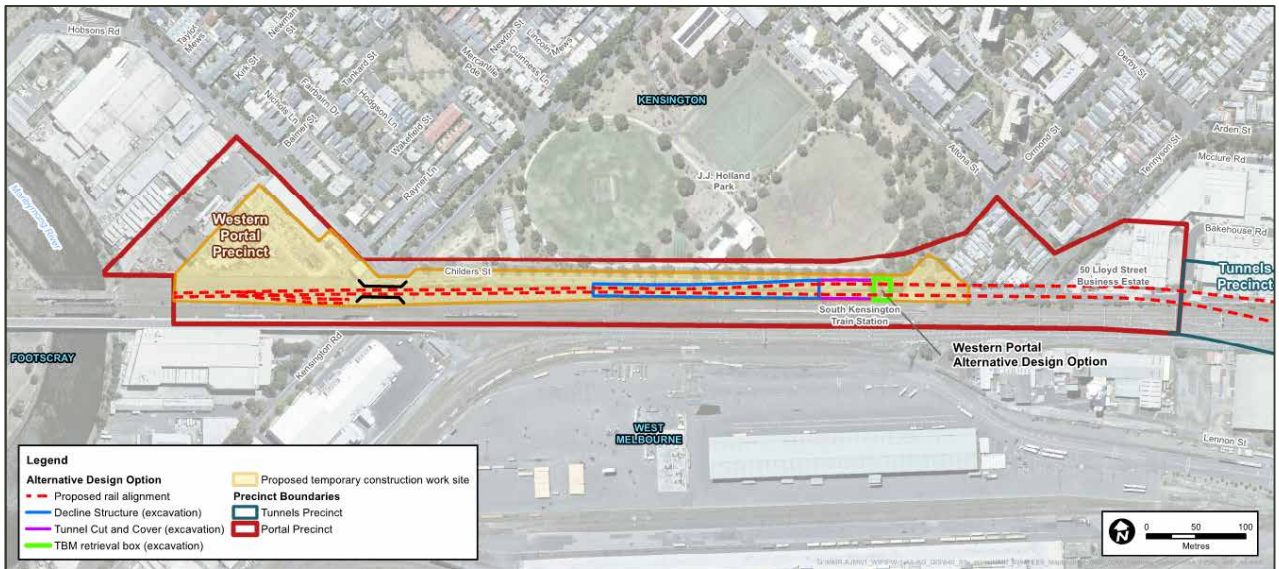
Western portal precinct construction work site outline – Alternative Design Option
